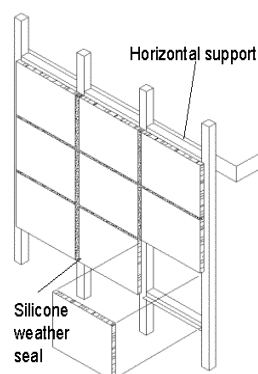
Detail of Structural Sealant Glazing Curtain Wall System <http://www.cwct.co.uk/facets/pack03/0108.htm>
